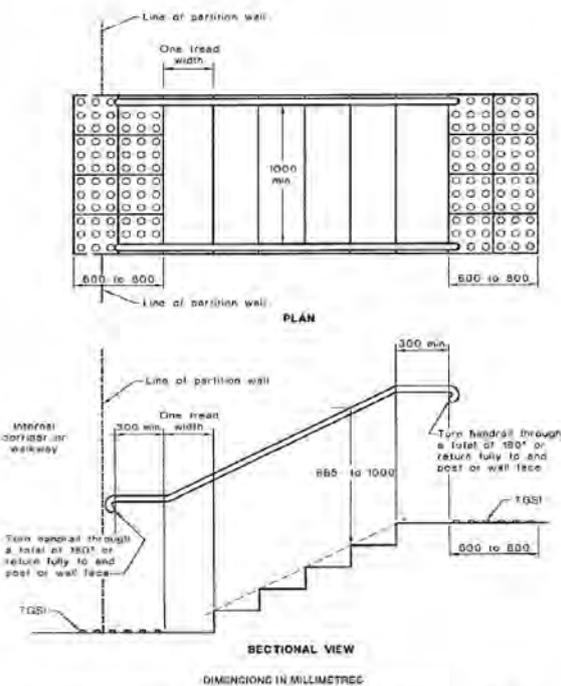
(B) STAIRWAY LOCATION AND HANDRAIL EXTENSIONS AT END OF STAIRWAY OTHER THAN AT LINE OF BOUNDARY
